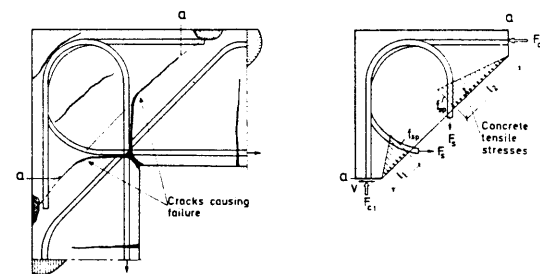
Crack Pattern and Forces Acting at Failure Stage
